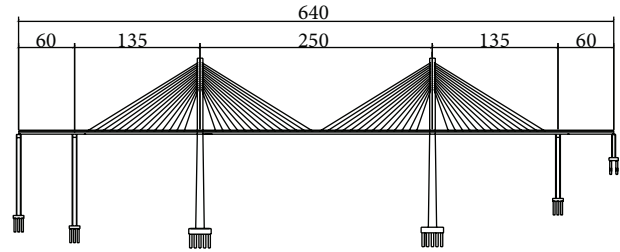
General arrangement of the cable-stayed bridge (unit: m).
